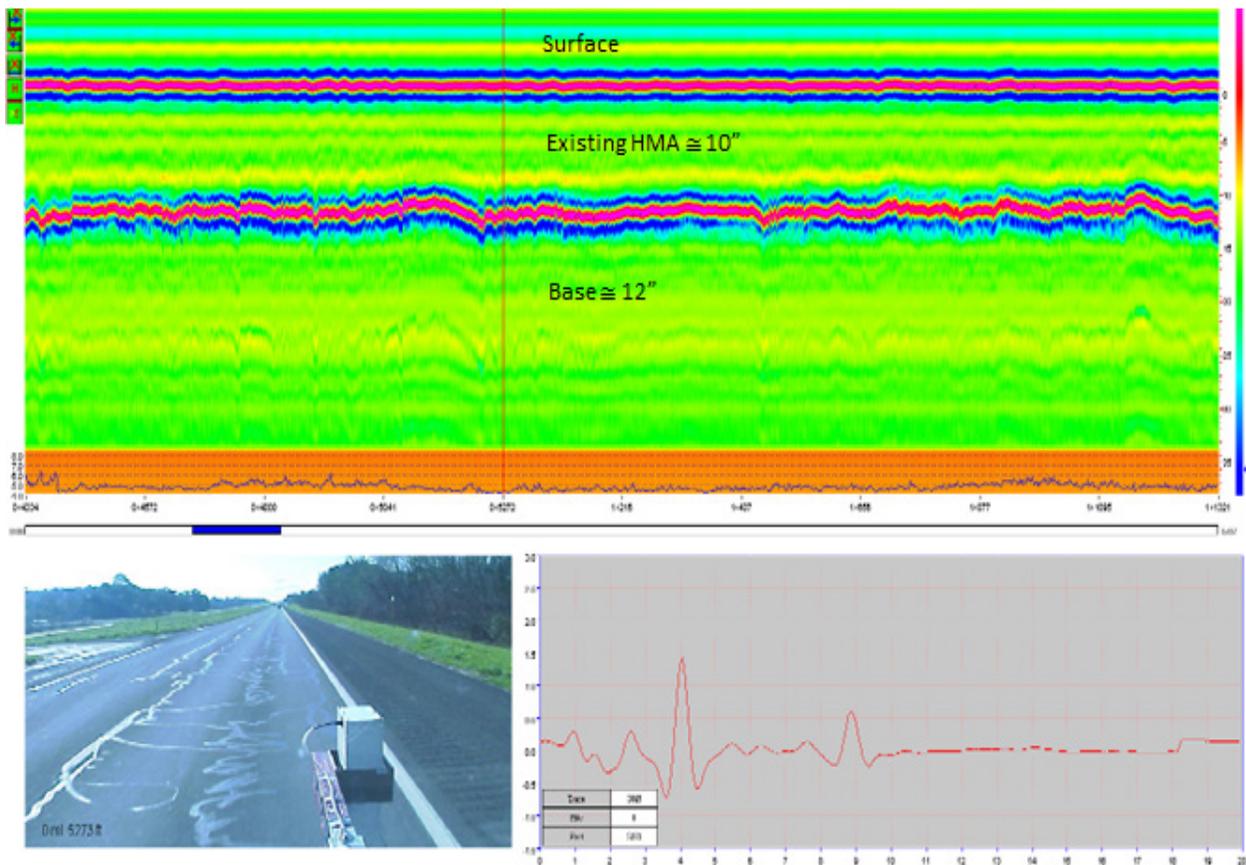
Example of Pre-Existing Cracks on the Modified Section (ATL).
